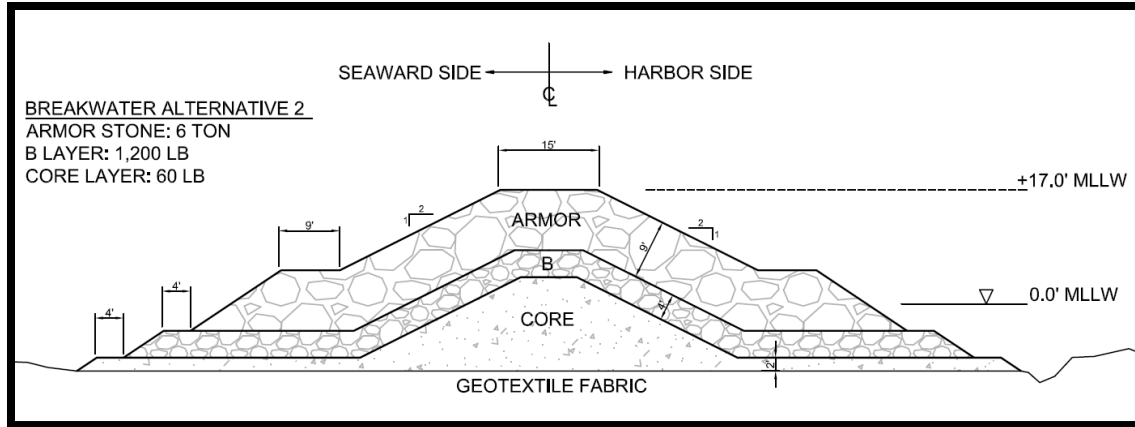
Breakwater Typical Cross Section (Alternative 2)
